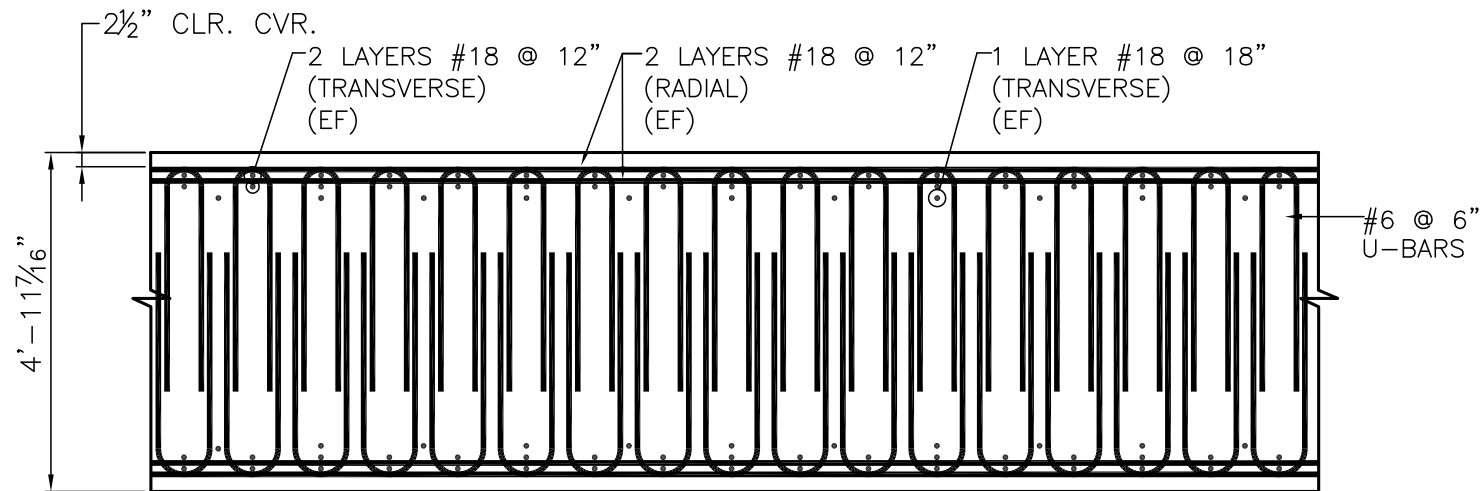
E.1-74—Reinforcement Pattern for RB Internal Structures Base Slab - Elevation -25'-7" to -20'-2"
